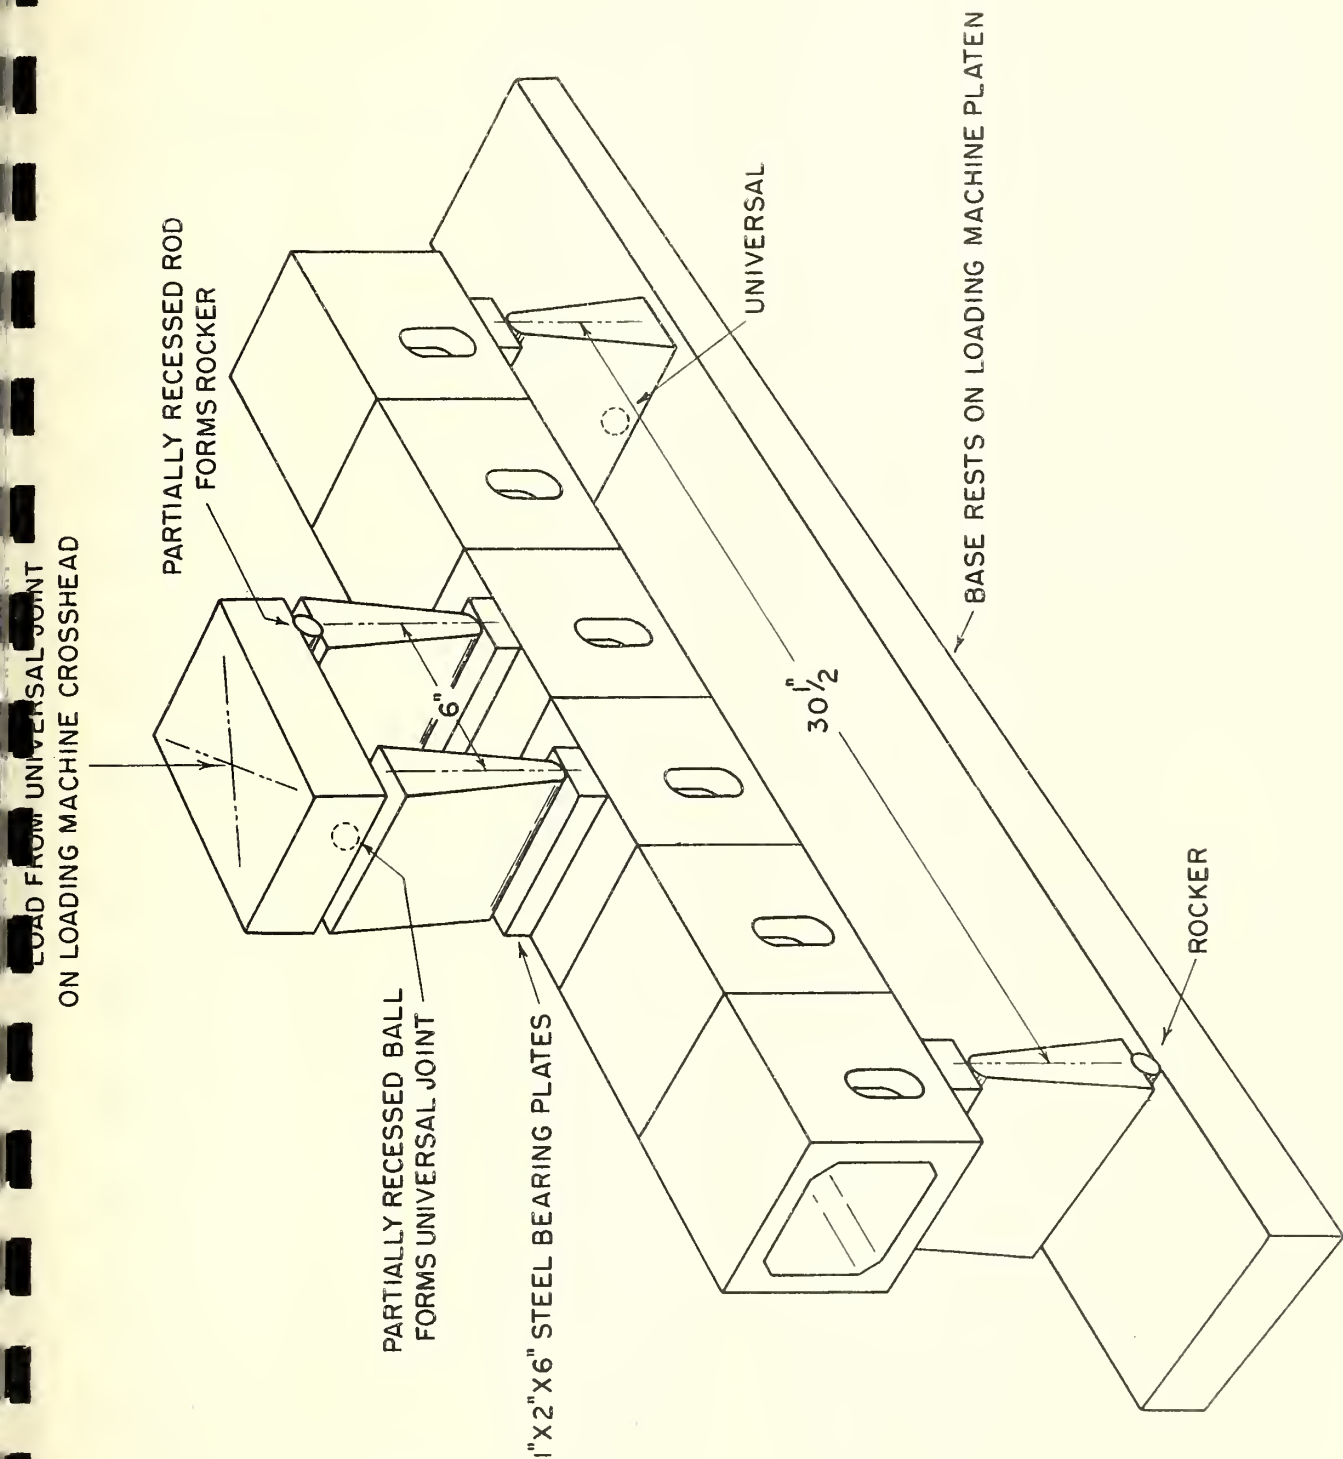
ARRANGEMENT FOR BEAM LOADING TESTS
